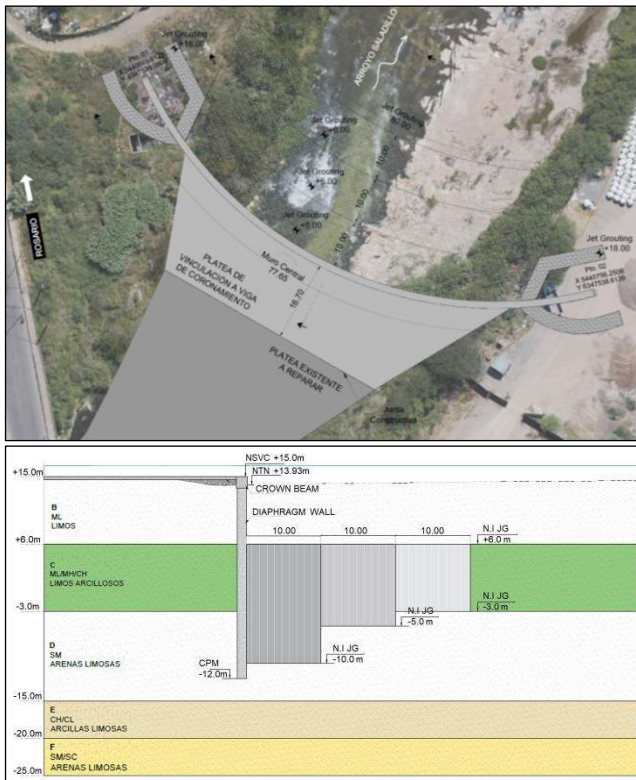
Tender project: diaphragm walls and jet grouting soil treatment.
